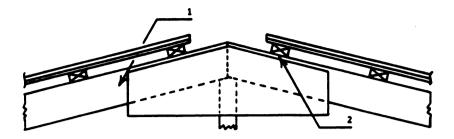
Location of test sites, Barn I. Truss No. 1, 9.7m (32') from north end. South elevation. Flashing not shown
